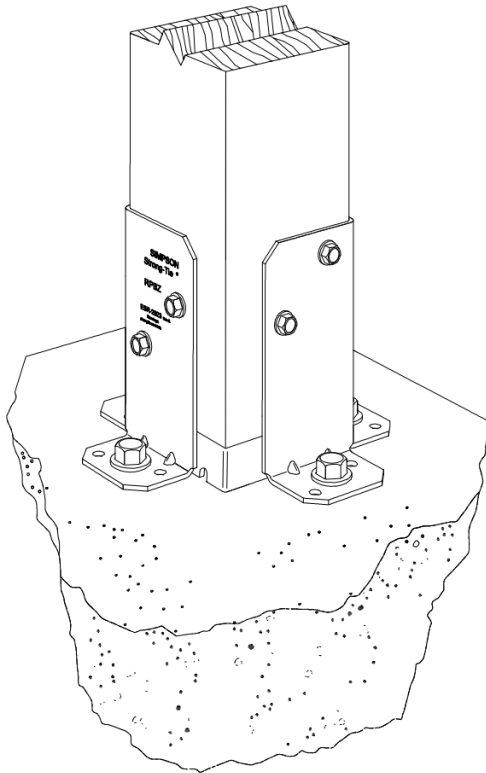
Conceptual retrofit detail for wood posts within the crawl space.
